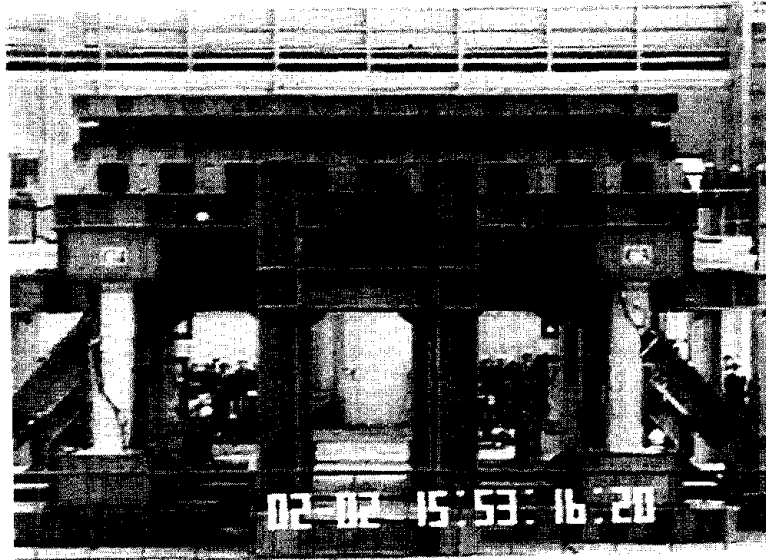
Crack Opening at C3 and C4 Columns (A-Type, North Side)
